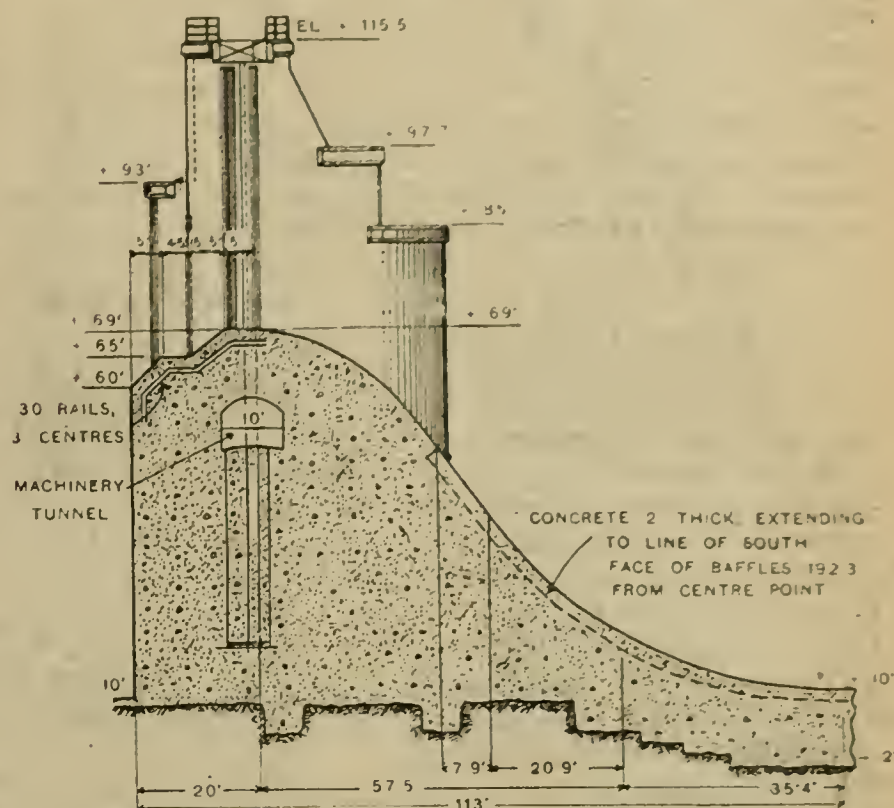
GATUN SPILLWAY DAM. SECTION, SHOWING RELATION OF ADJACENT PIER TO THE DAM.
